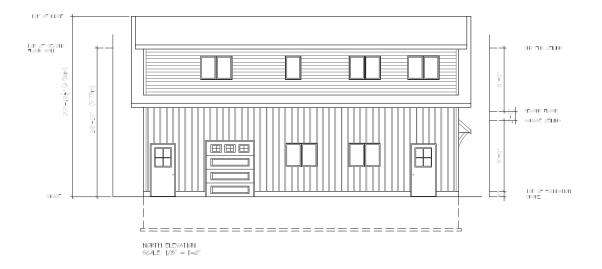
Proposed Garage elevations File # A09-24 Ryan Van Horne – 299 Glendon Road
